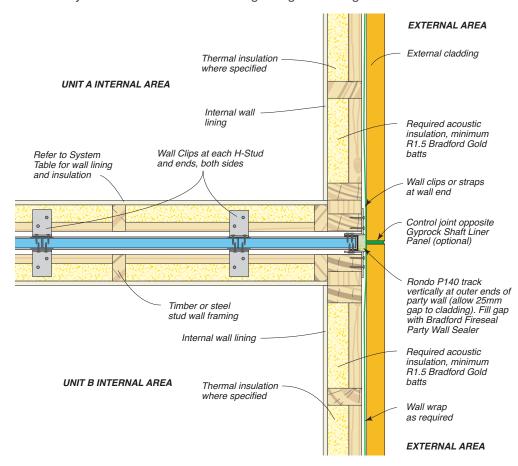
Junction Of Party Wall And External Wall With Lightweight Cladding Direct Fixed to Studs - Plan View
